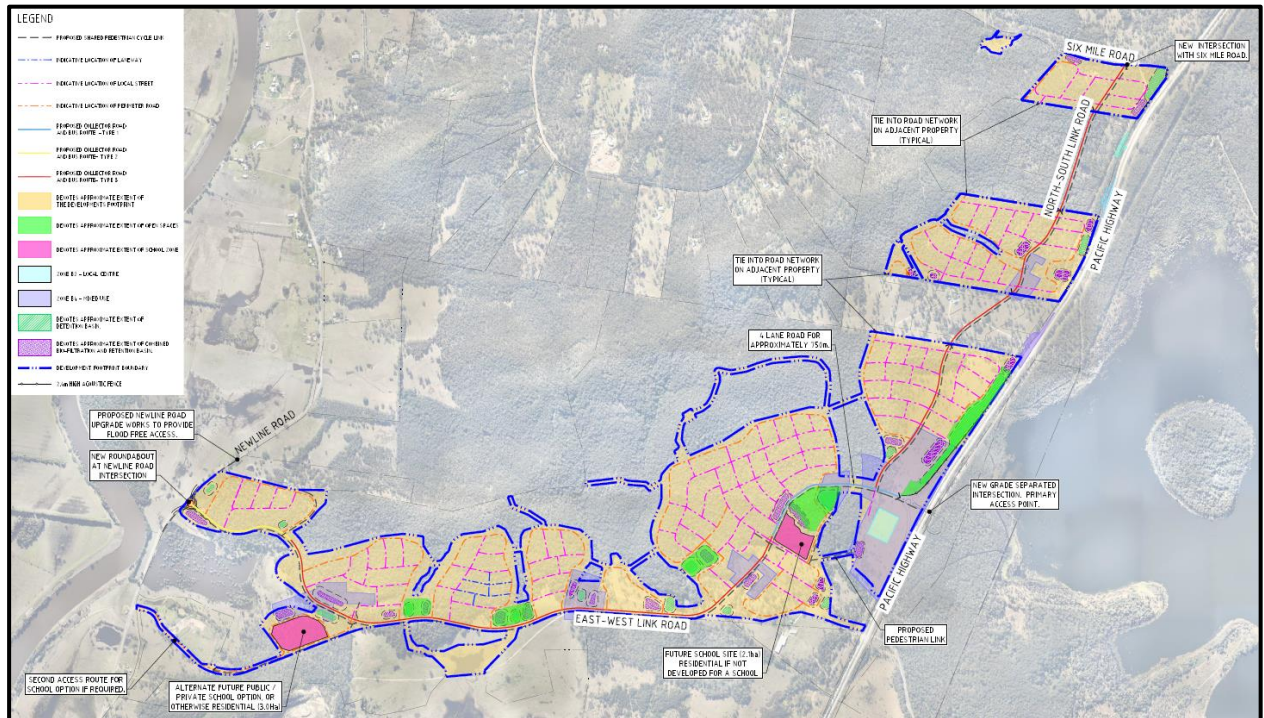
Road Hierarchy and Connectivity Plan (Indicative)
